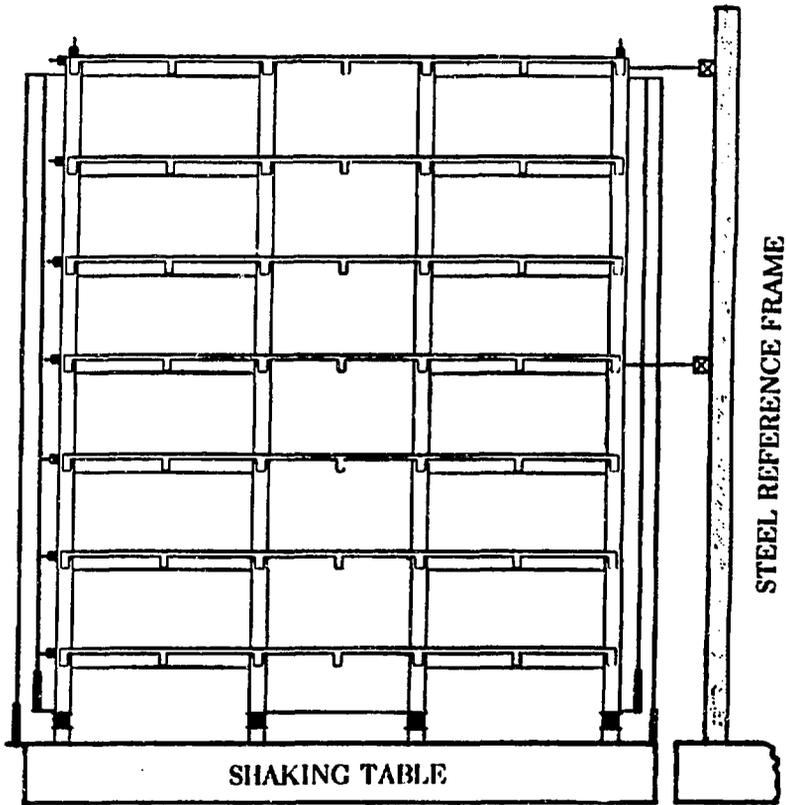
1/5-Scale Reinforced Concrete Test Structure
